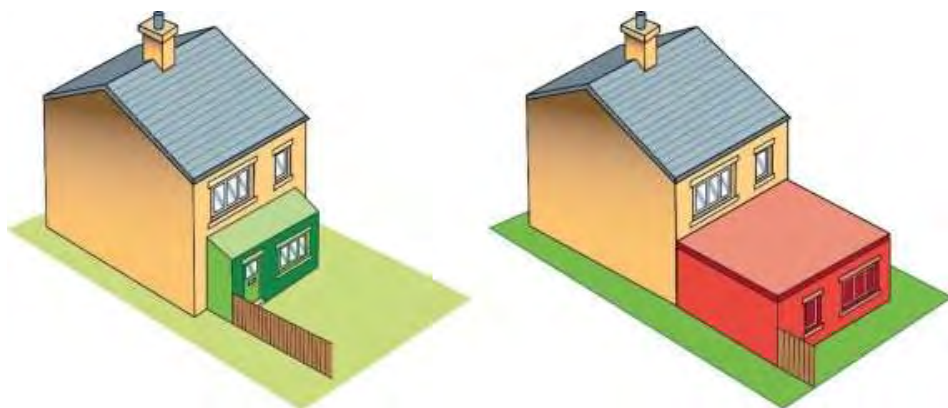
The left image shows a suitable small scale front extension with an appropriate roof detailing. The right image shows an over dominant and unproportioned extension with a flat roof which does not match the existing house.
